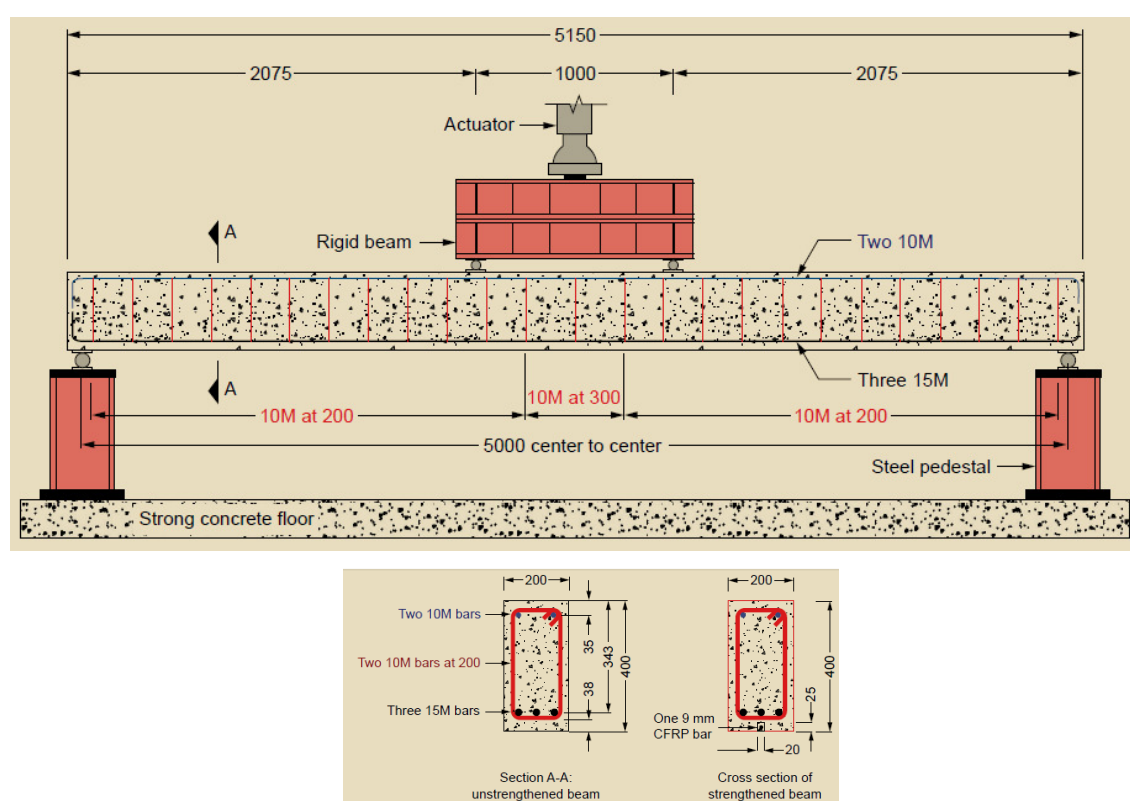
Test setup, elevation, cross-section, and reinforcement details (El-Hacha and Gaafar, 2011).
